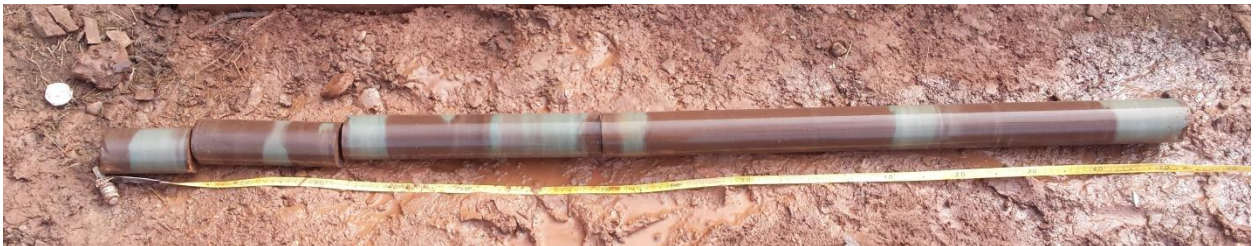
Run 18 from elevation 82.8 to 81.3m.
